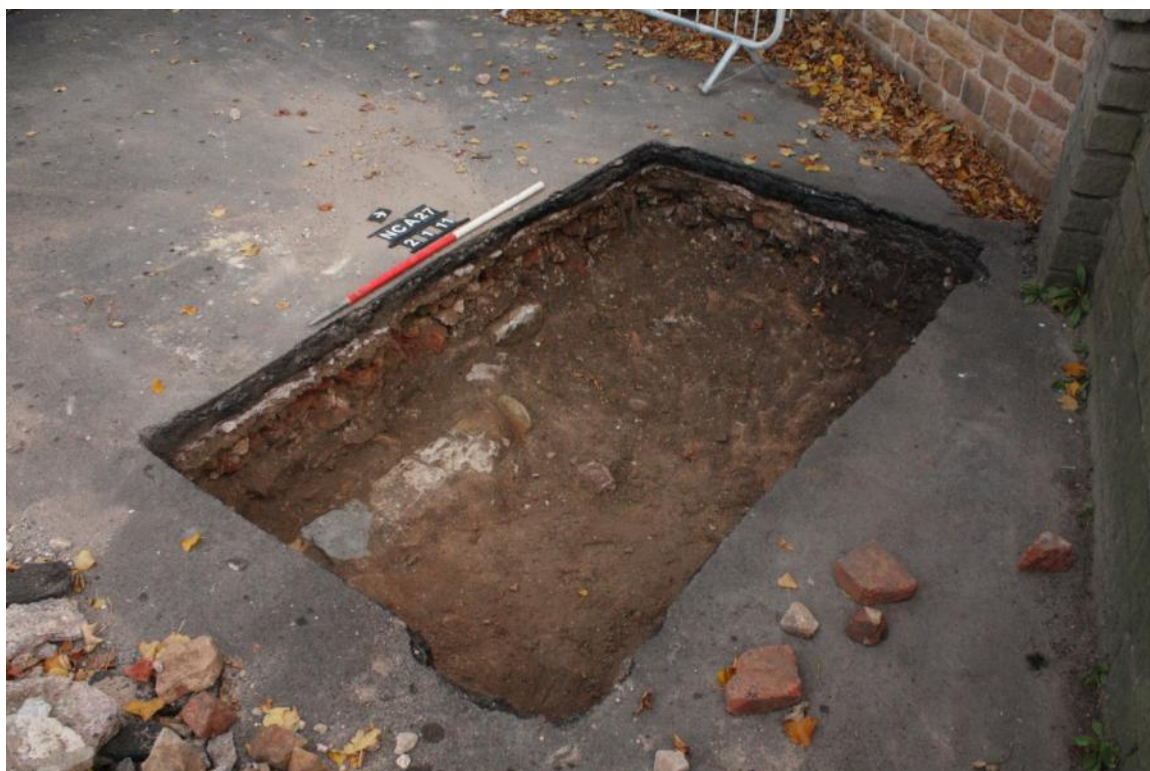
Foundation Trench 2.1.11 Oblique Planning Shot Looking North. Visible Culvert. Scale 1m
